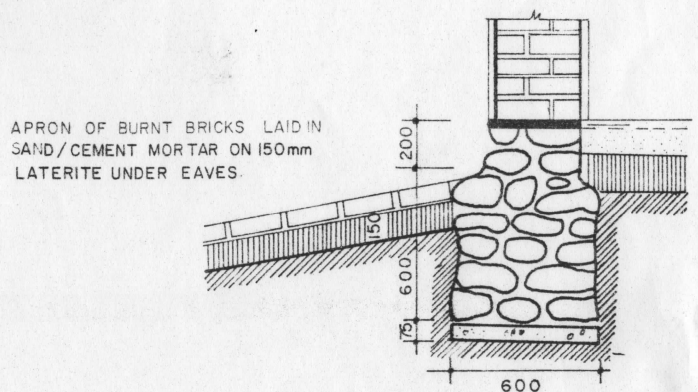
Stone foundation suitable for adobe or sun-dried and burnt brick walls, with termite shield and damp-proof membrane (after ref 11)
